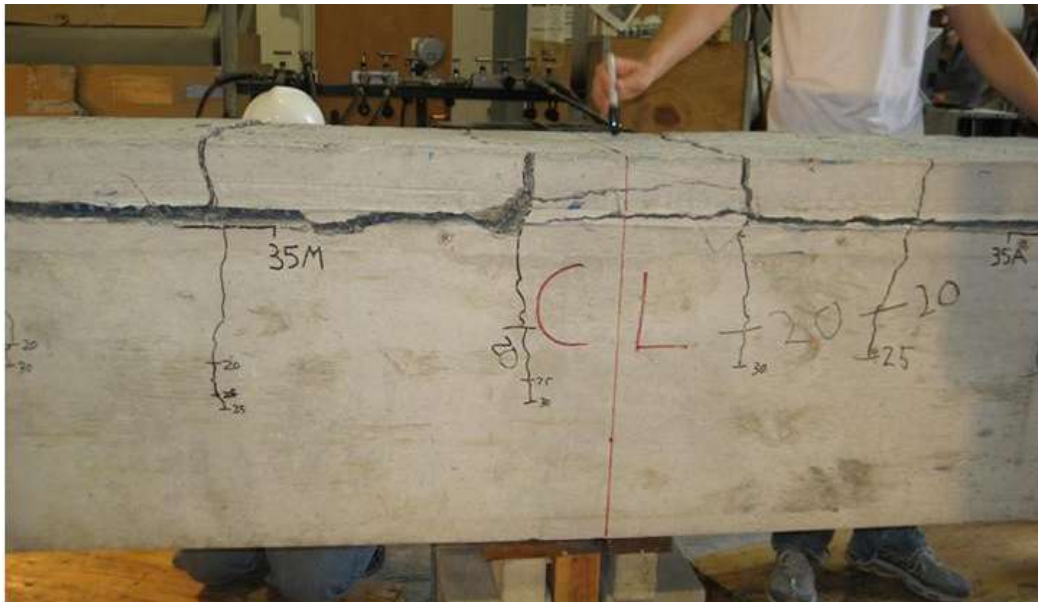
Beam 4, centerline showing separation of concrete, 52-kip end load.
